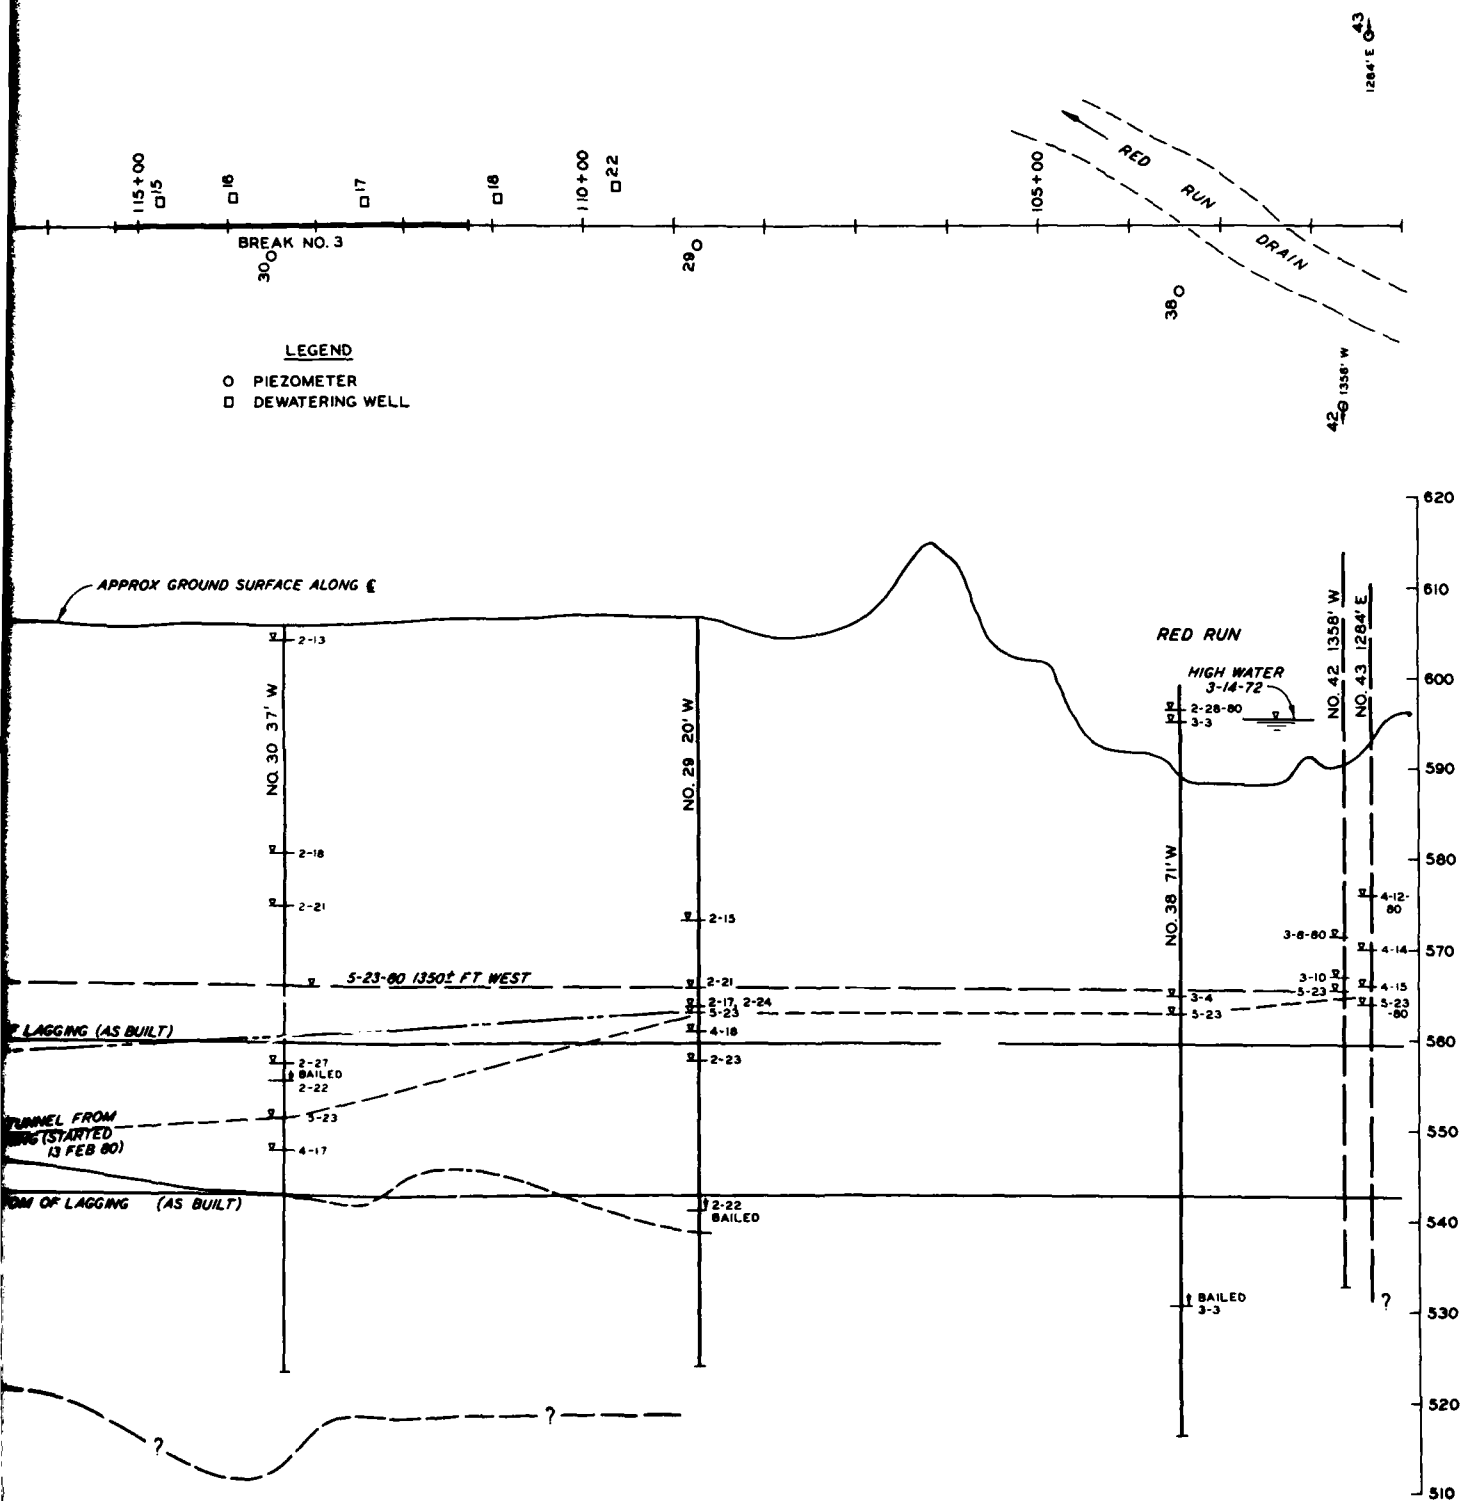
Summary of groundwater conditions, 15 Mile Road/Edison Corridor Tunnel Failure Study
